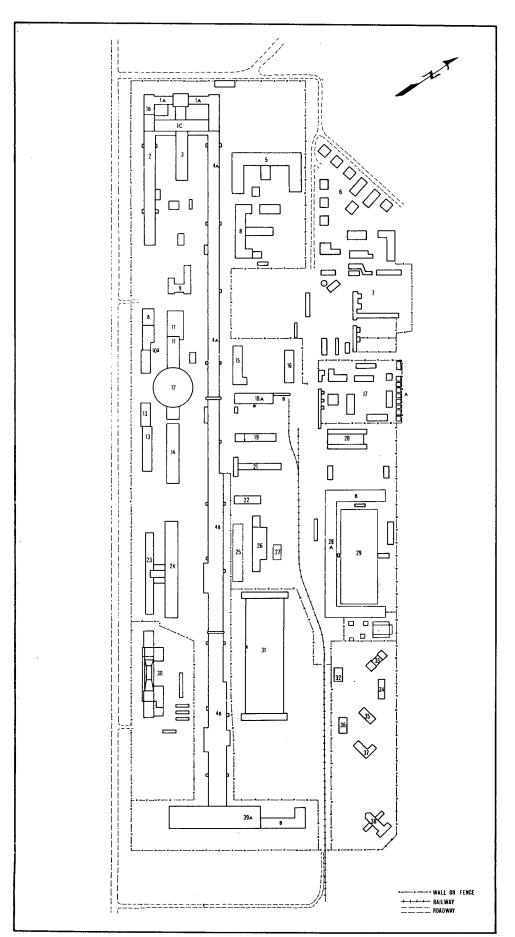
Building #39 Apr 65 DIA 5901007265/32
